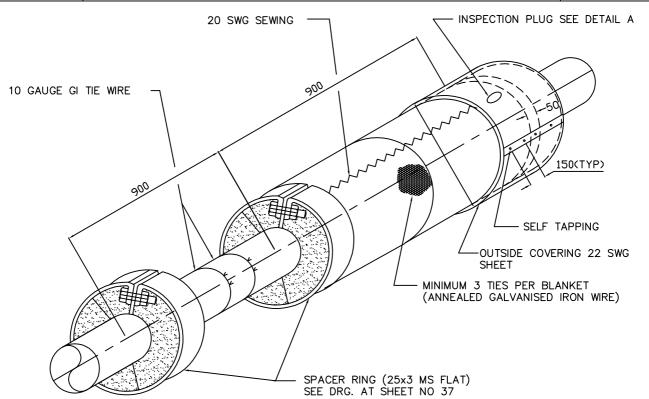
SINGLE LAYER BLANKET INSULATION WITH ALUMINIUM SHEET FINISH
